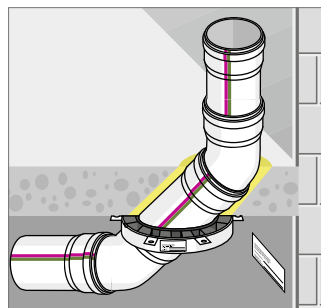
Angled fireproofing collar (only for installation on ceiling)
